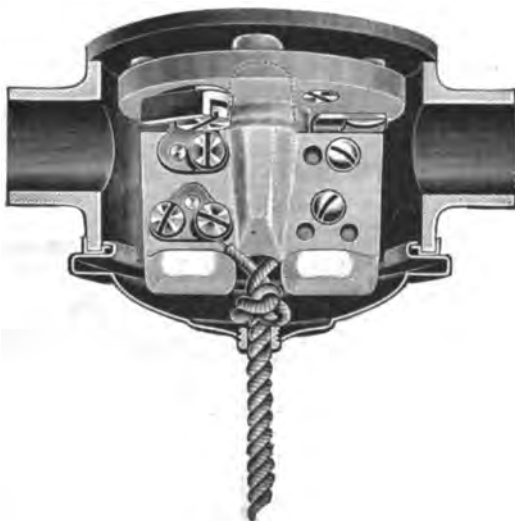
CEILING PENDANT BLOCKS FOR BRANCH CONDUIT BOXES.
